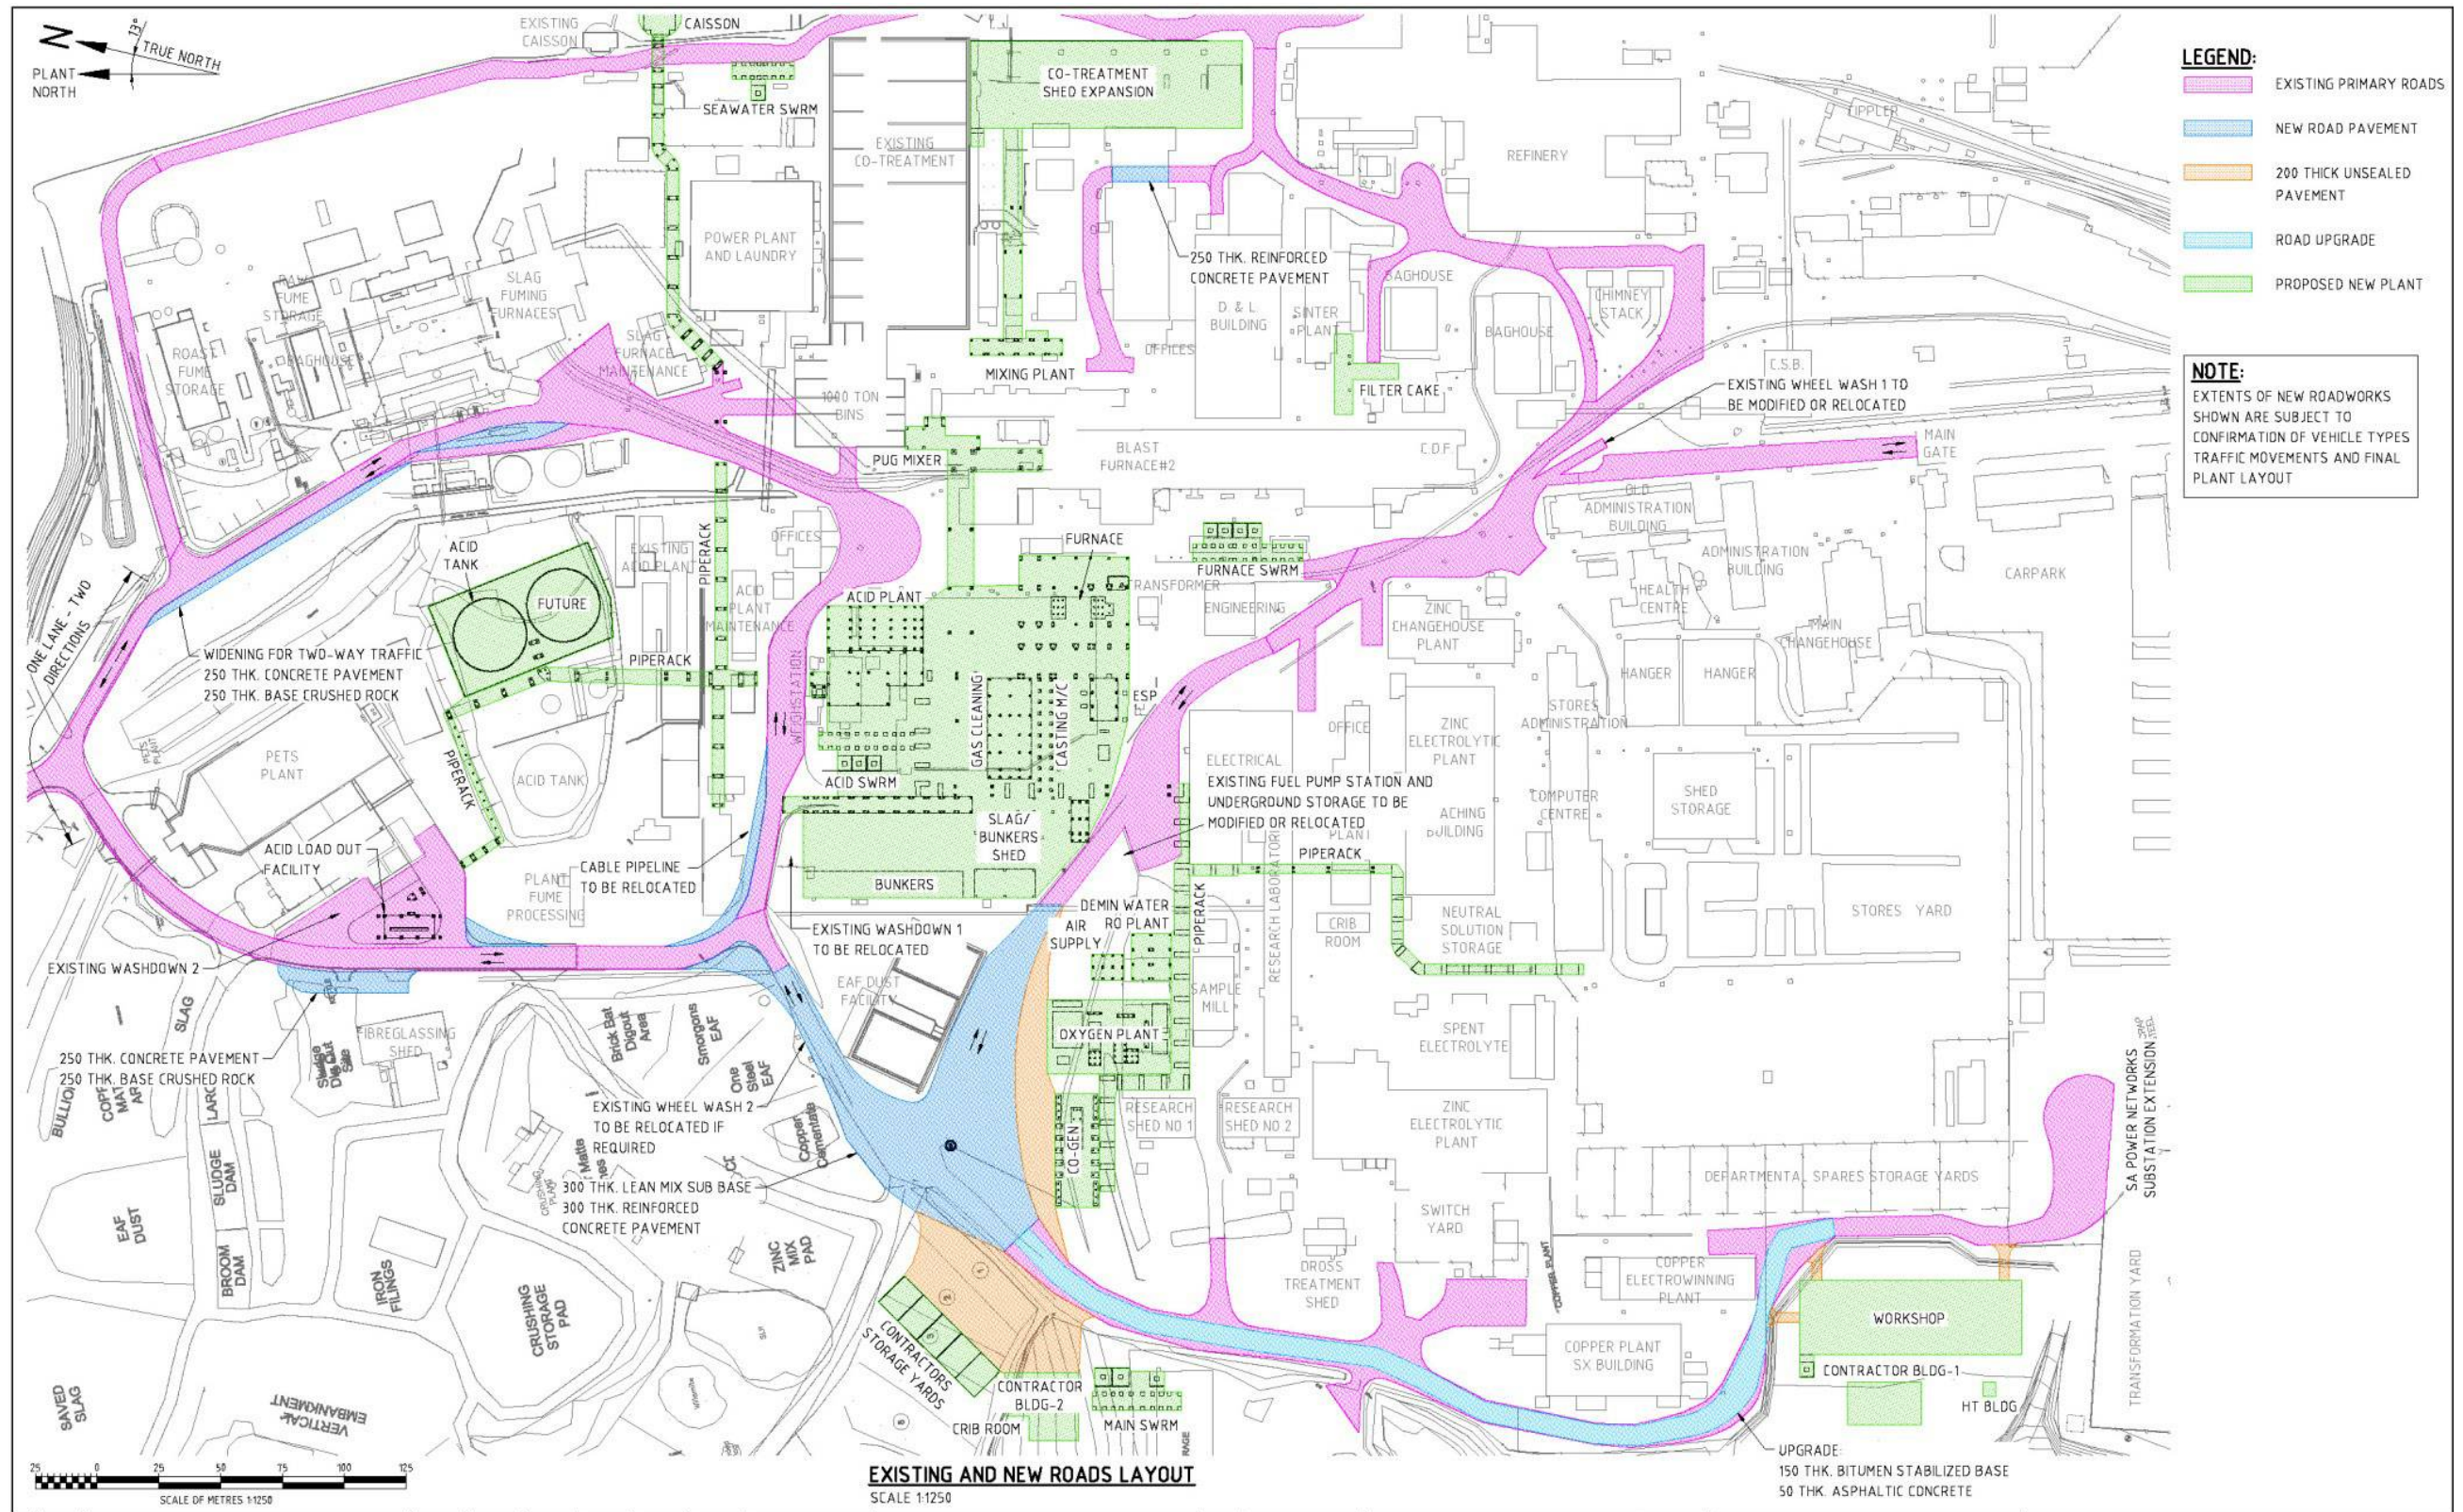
Transformation PFS proposed plant zones and areas existing and new roads layout
